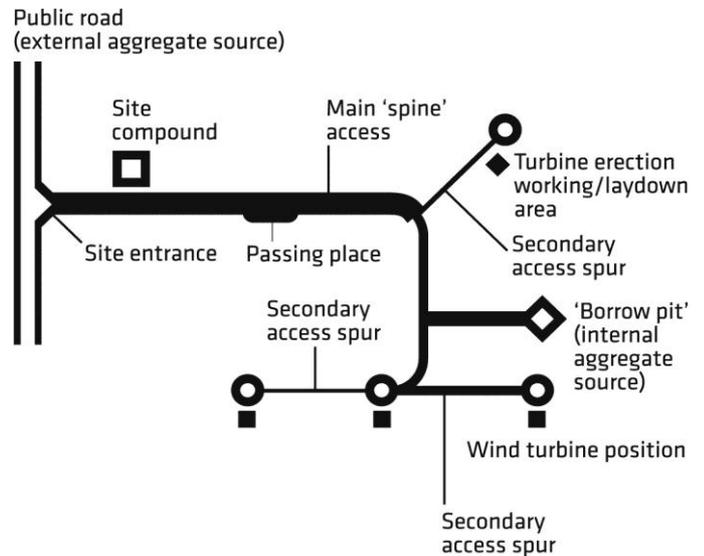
Schematic of road thickness, denser lines indicate a higher construction traffic design load
